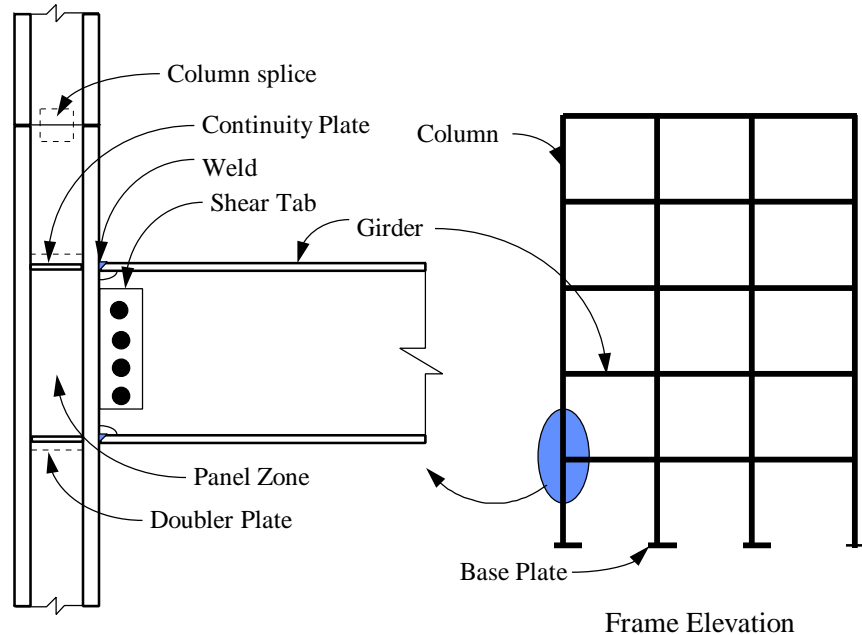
Elements of Welded Steel Moment Frame
